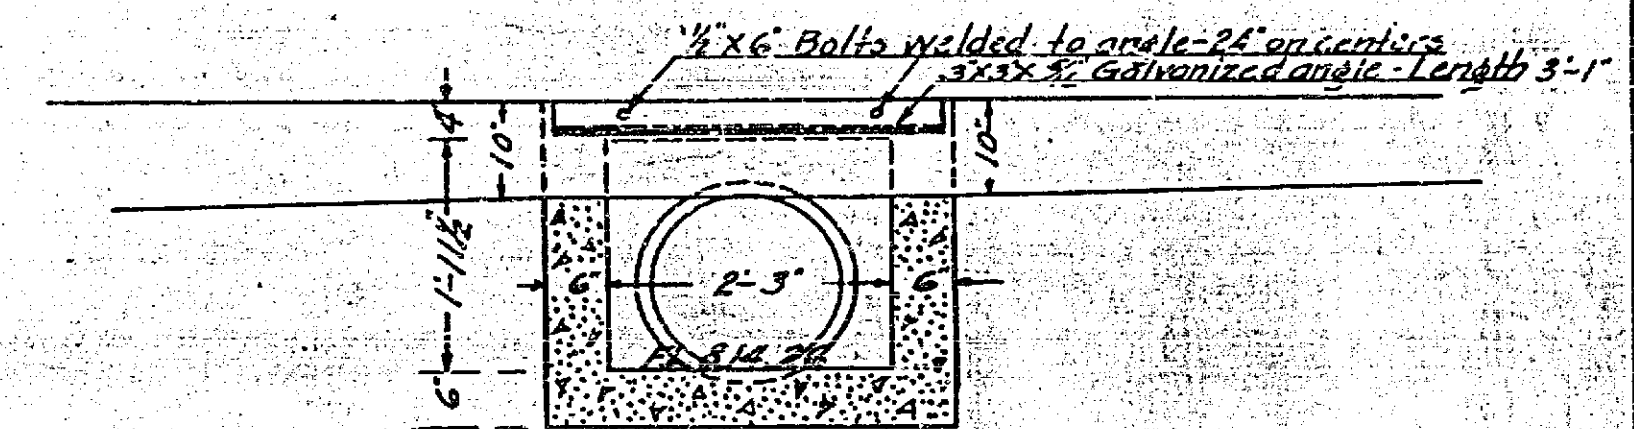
# DETAIL OF REINFORCED CONCRETE CATCH BASINS
